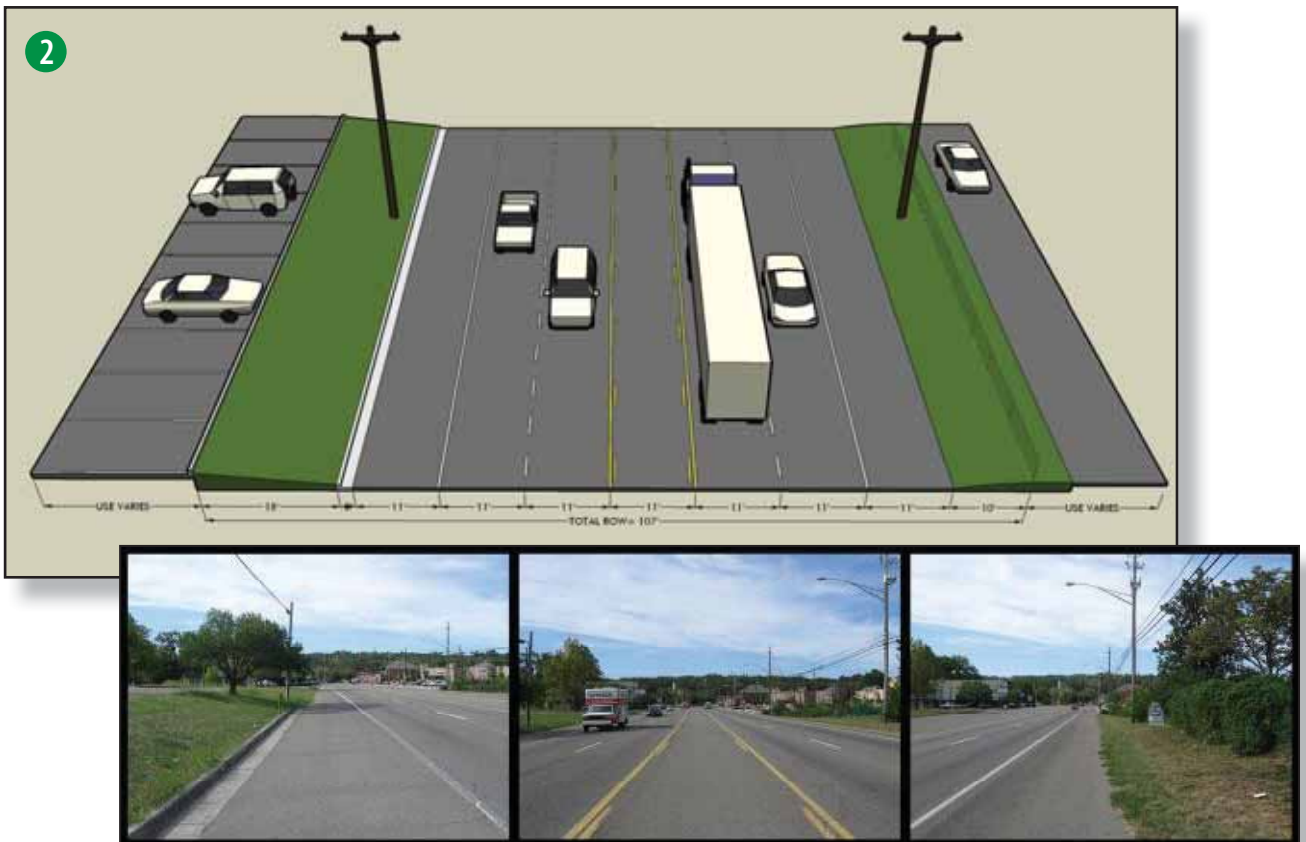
Typical Section: Cedar Lane to Hotel Road — Existing Conditions
